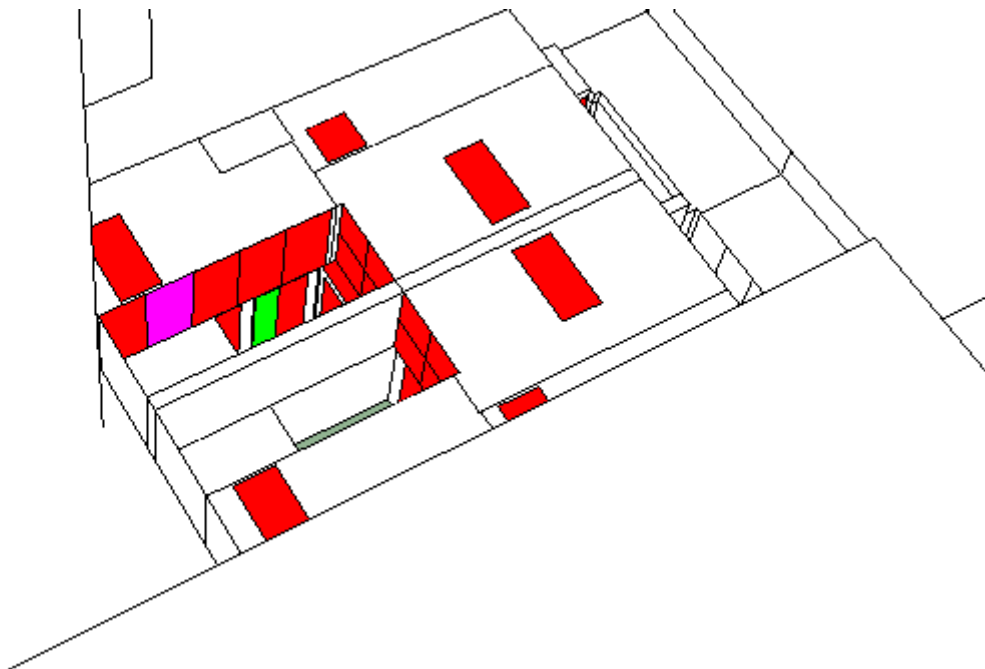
Rear Elevation Light Wells Window Openings – (South)
